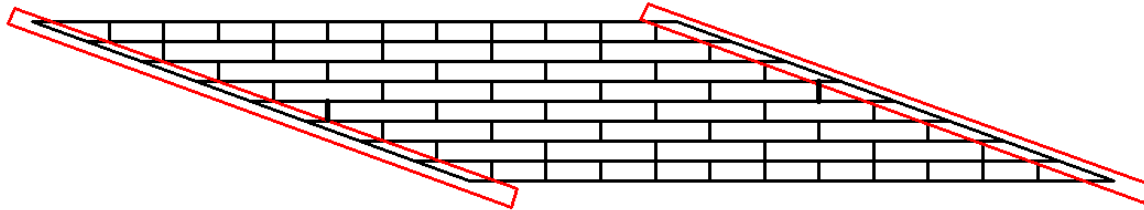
Recommended staggered framing arrangements for straight parallel-skewed bridges.
